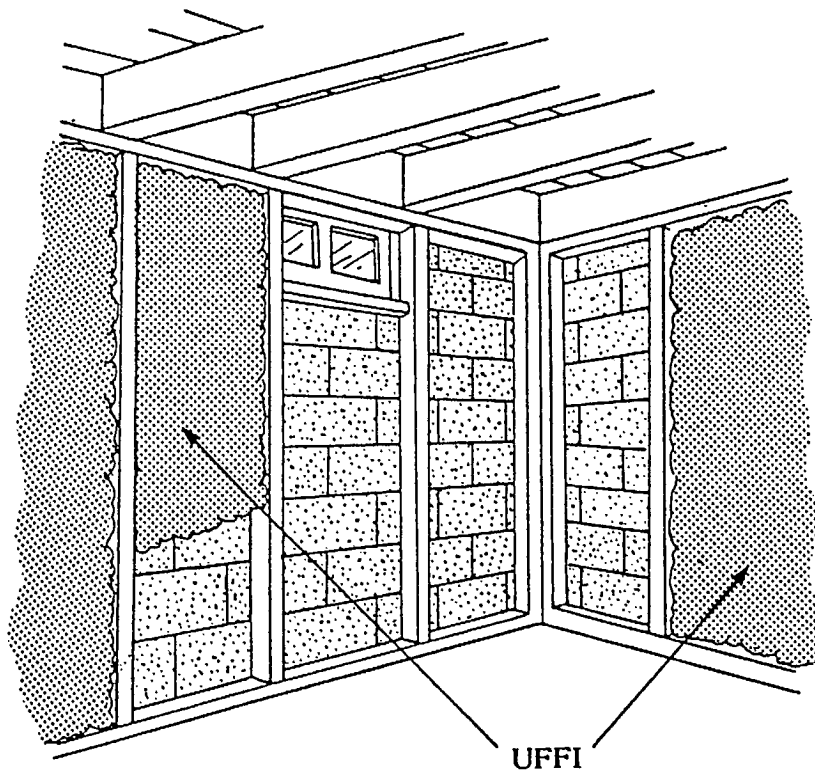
BASEMENT WALL CONTAINING UFFI
